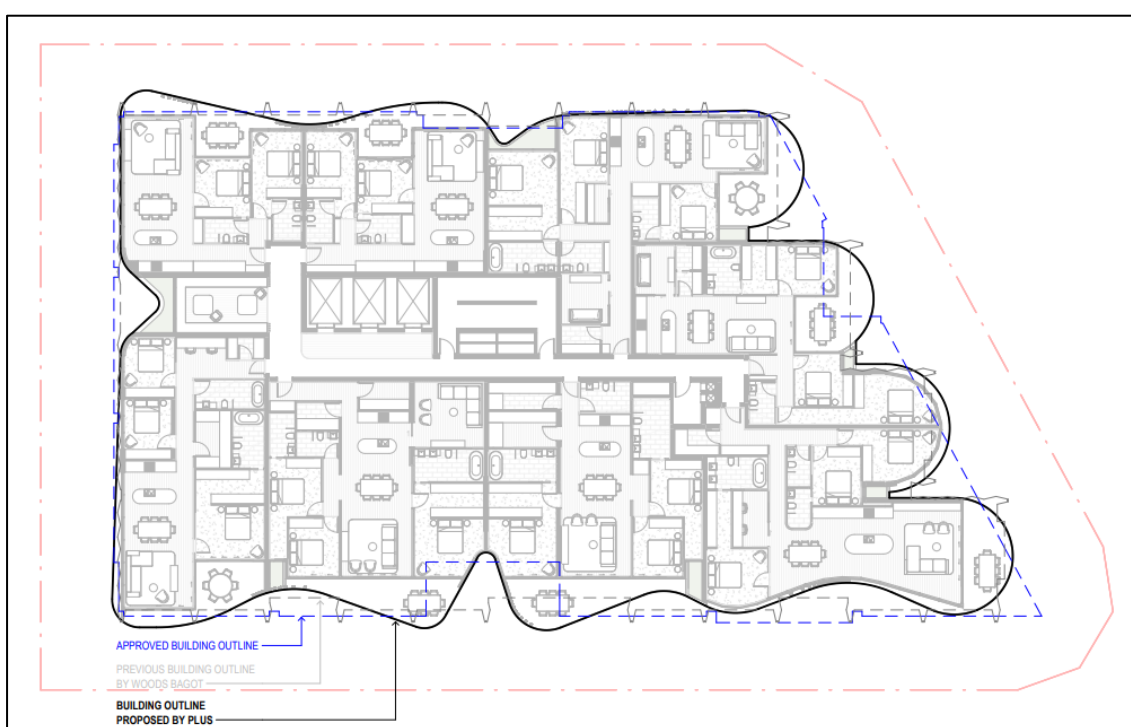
Extract of Building Outline Demonstration Plan (Source: Plus Studio)
